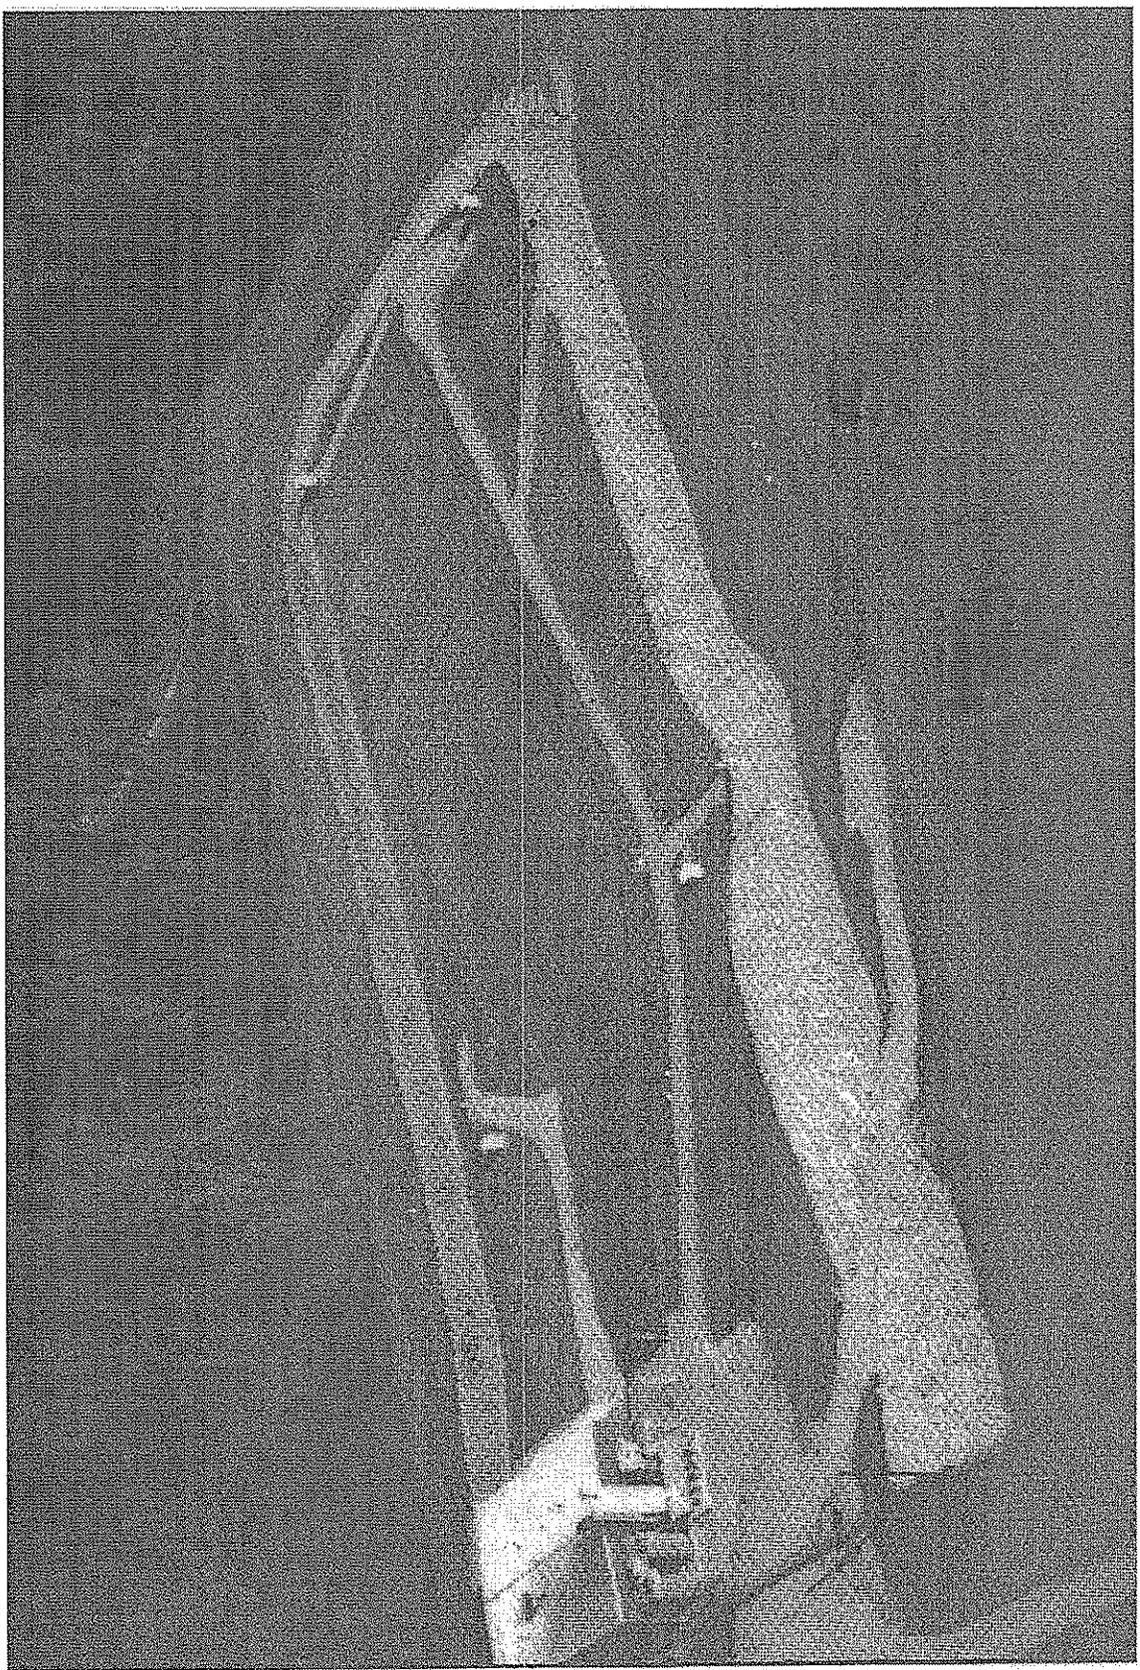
AERIAL PHOTO OF SITE FOLLOWING REMEDY CONSTRUCTION
